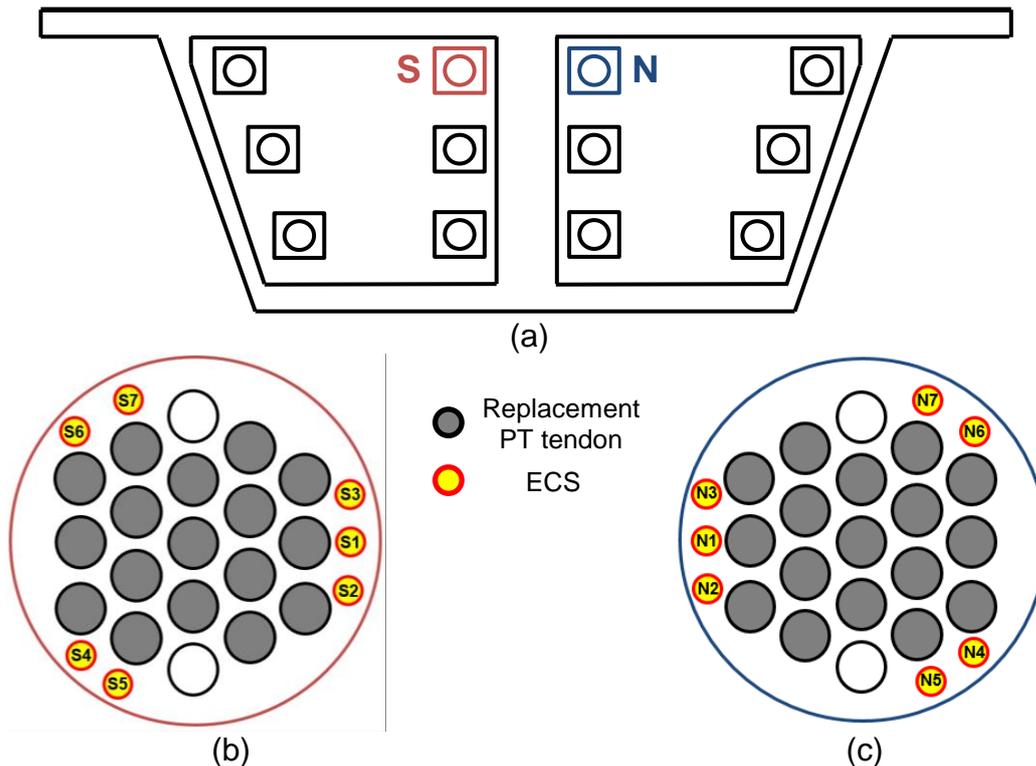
(a) A front cross-section view of the Seoho Bridge A2 girder; (b) cross-section of anchor head in S; (c) cross-section of anchor head in N
